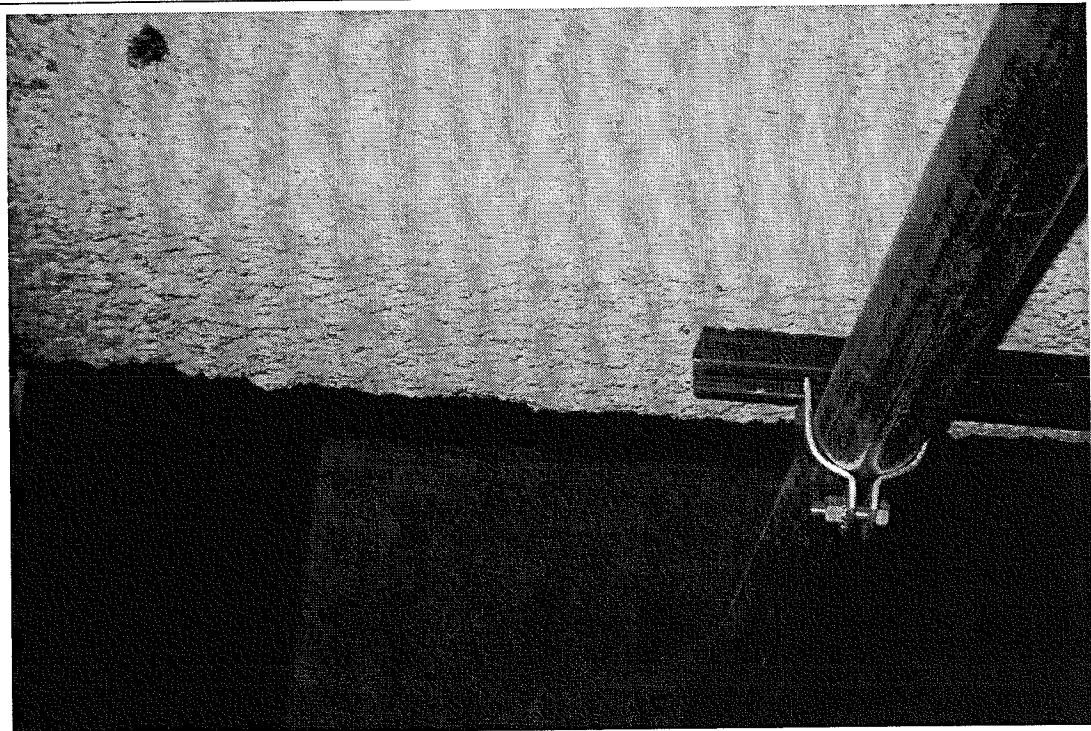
Main Passenger Lobby Upper Mezzanine Office Area – Conduit and anchor bar attached to fireproofed sprayed concrete deck located above suspended ceiling
